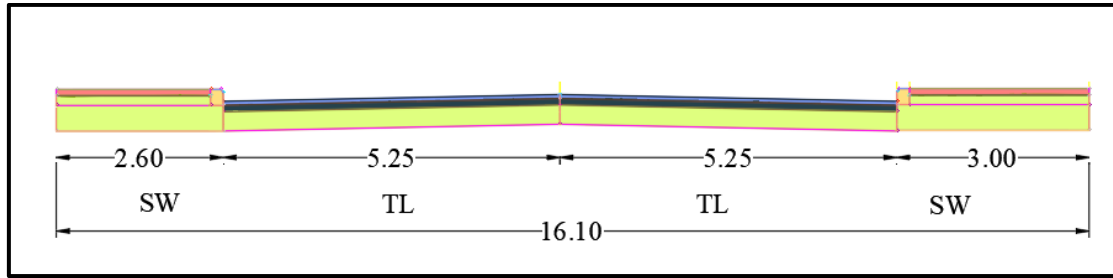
At Al-Fatemiah School Section No.3 Existing Cross Section
